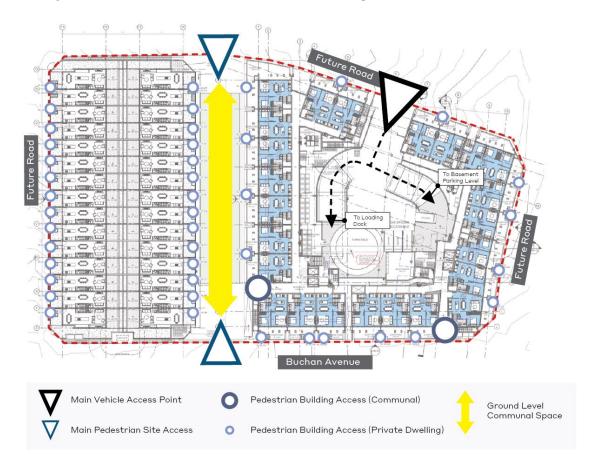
Proposed Site Access Plan Source: Cox Architecture / Ethos Urban
